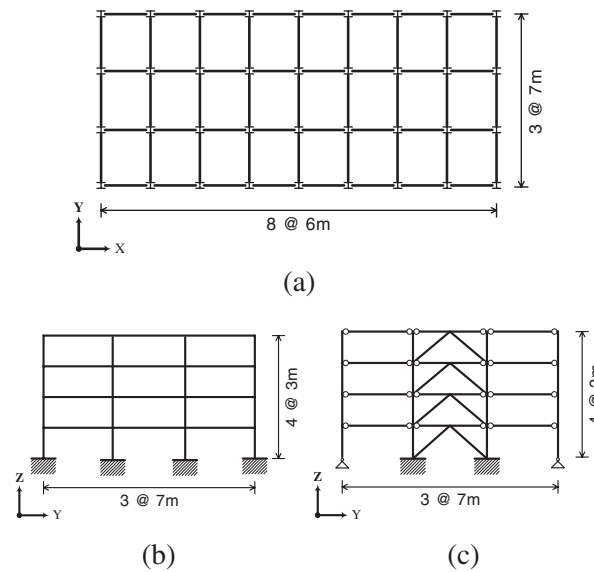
Structural shape of the 4-story MRF and the BF: (a) plan view of MRF and BF; (b) side view of MRF; (c) side view of BF
